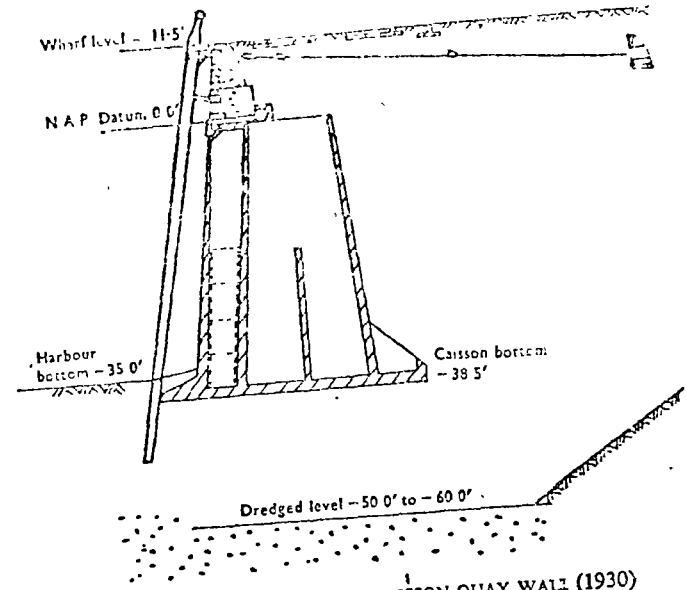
CROSS SECTION OF CAISSON QUAY WALL (1930)
